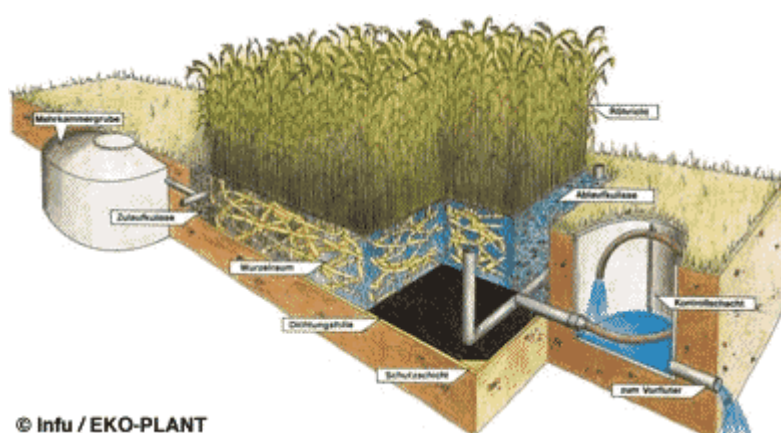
Lay-out of a small-scale constructed wetland (<http://www.ekoplant.de>).
